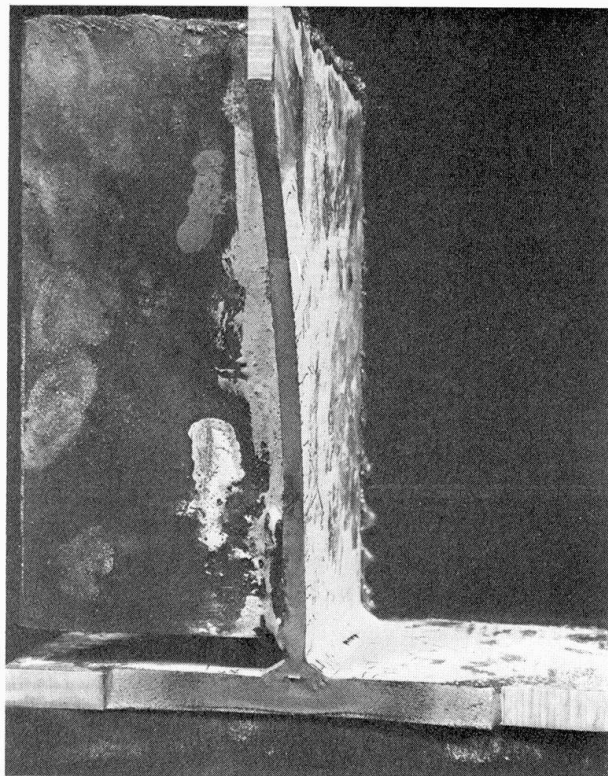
Typical Fatigue Crack Surface at Web Stiffener at Failure.
